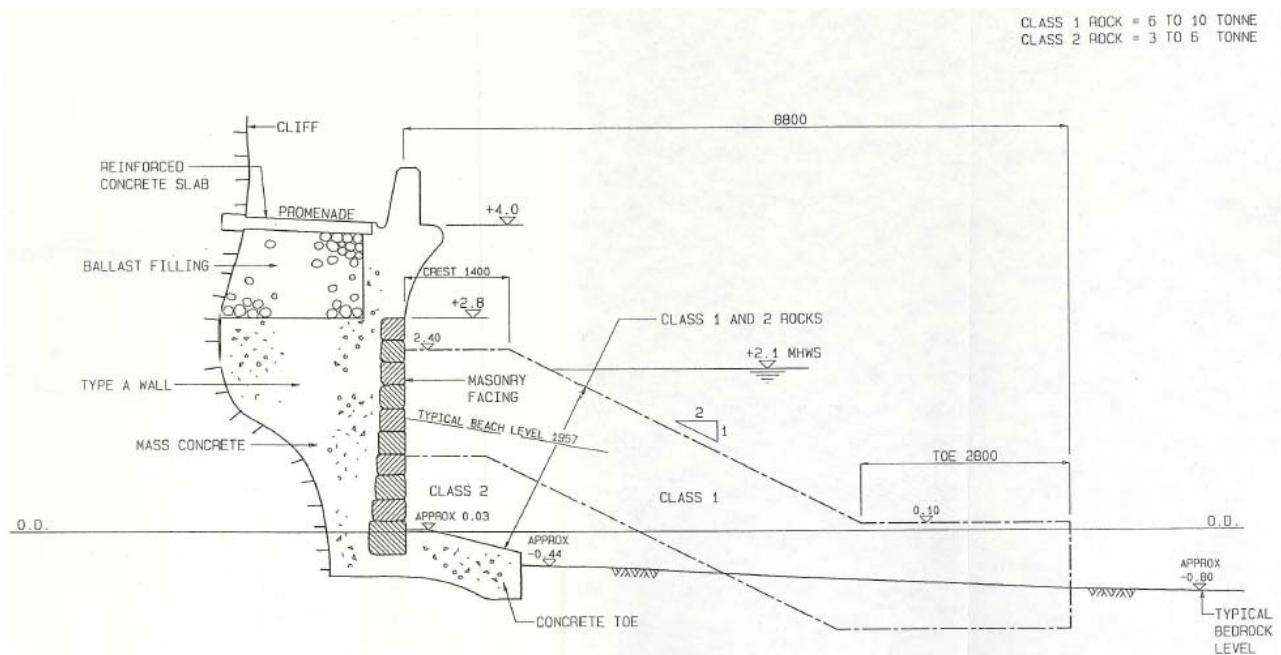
1957 seawall and the 1994 rock revetment construction details (from Posford Duvivier, 1994)
